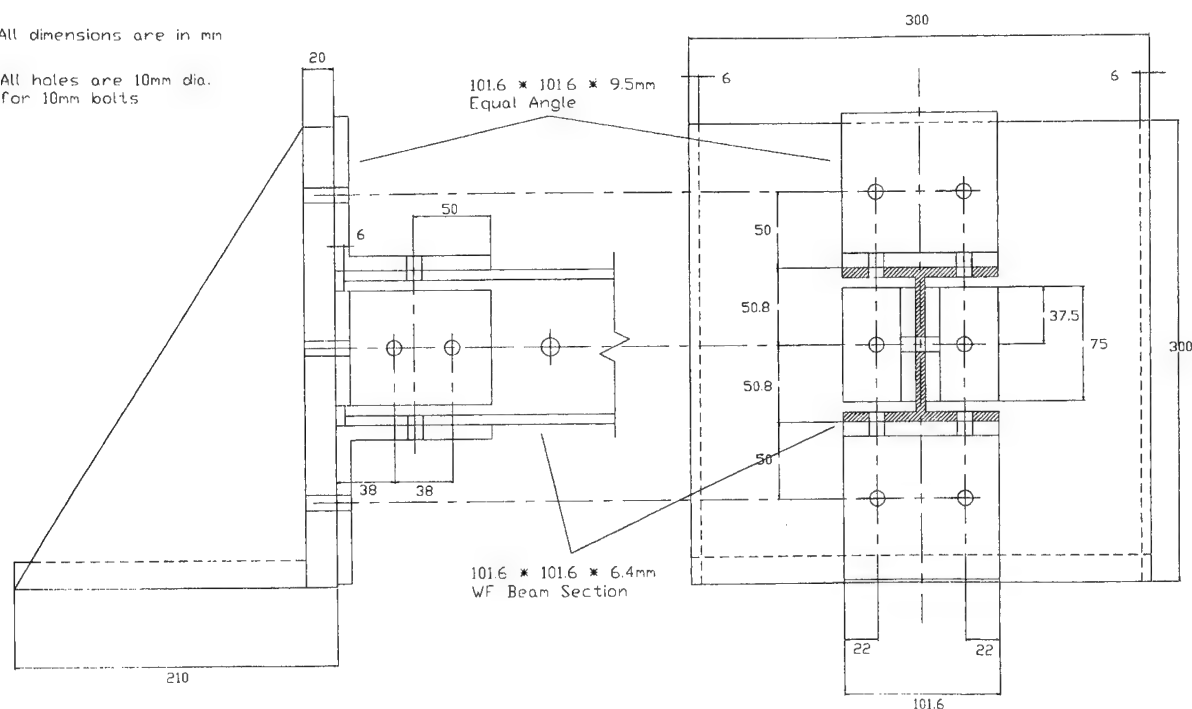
Details of bolted web and flange cleat connection (Note: The bolted web cleat connection details are similar but with the flange cleats removed).
